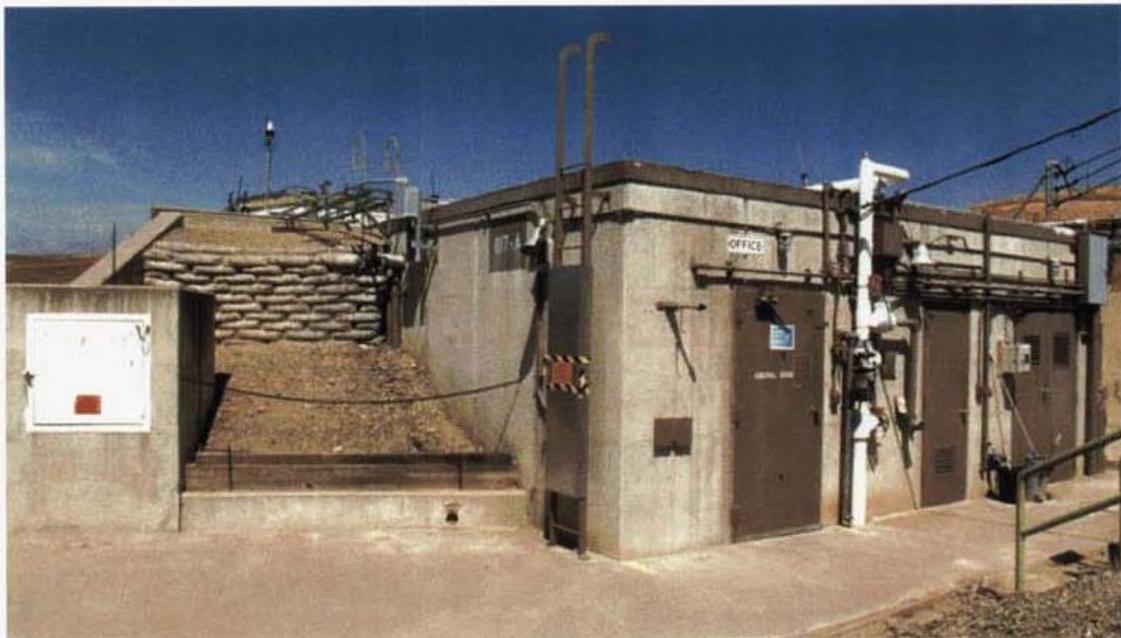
East Elevation of Building 817A (LLNL Archives, 2003)
